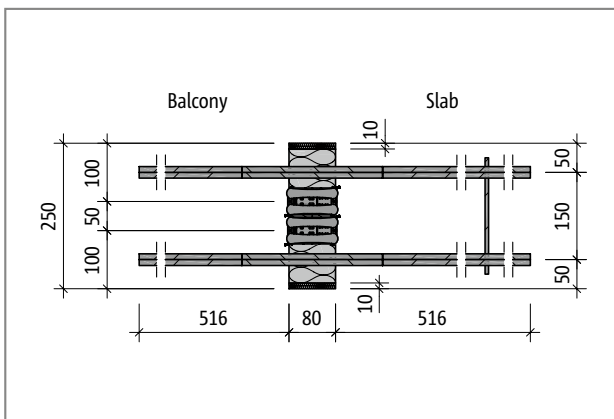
Schöck Isokorb® T type Q-E-VV5: Product layout; lateral fire protection boards
